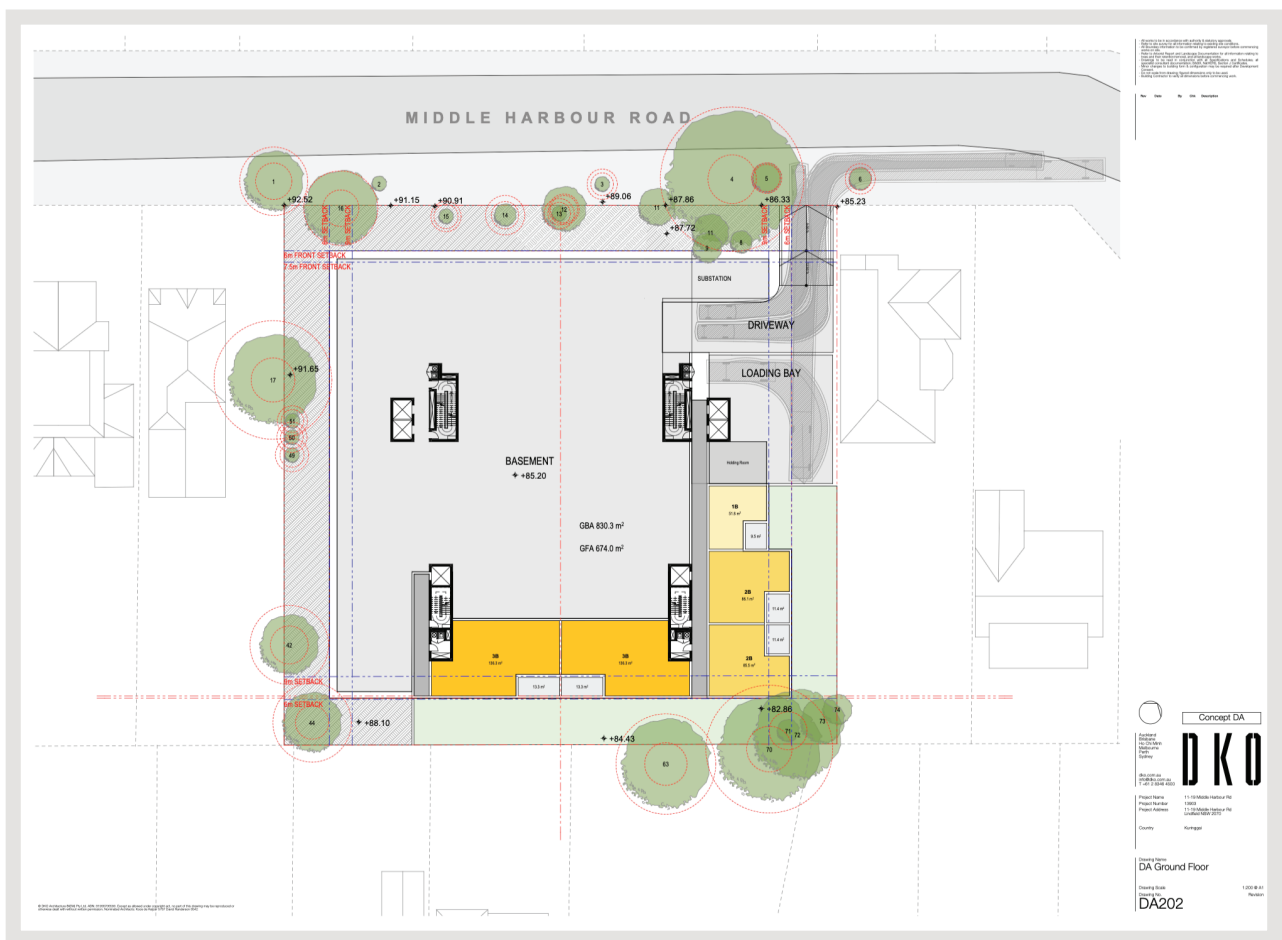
Typical floor plan of the proposed design by DKO Architects.
